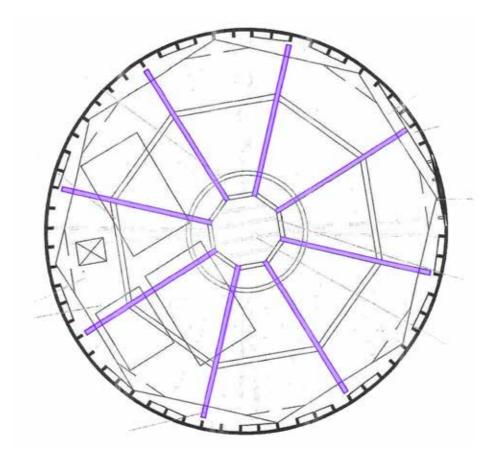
Trusses (T) in plan view (2019) © H&R (SLHA edit)
